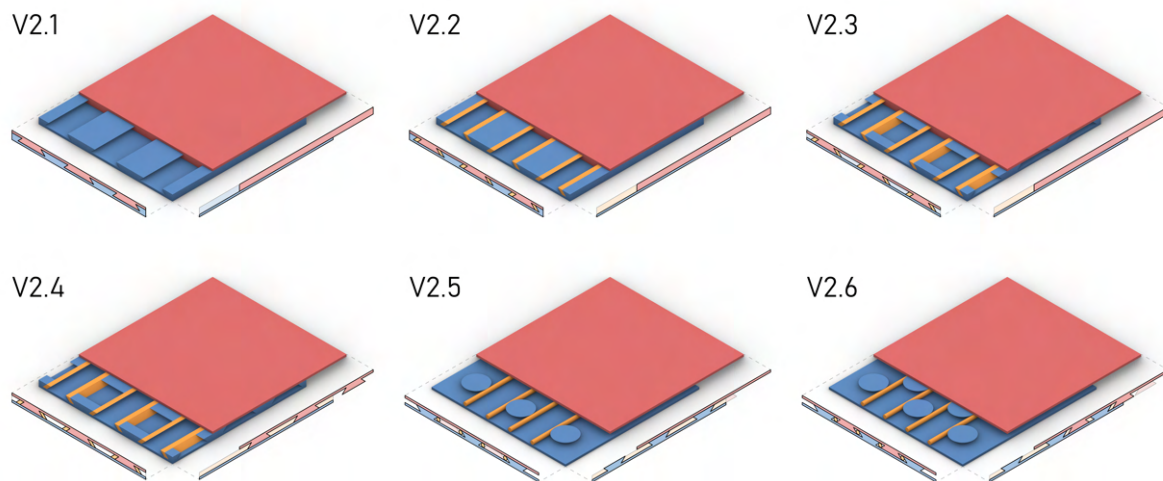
Evolution of the V1 interlocking geometry from continuous sliding assembly towards direct placement and post-placement locking. Each variant is shown in isometric view together with two cross-sectional views taken through the centre of the specimen.
